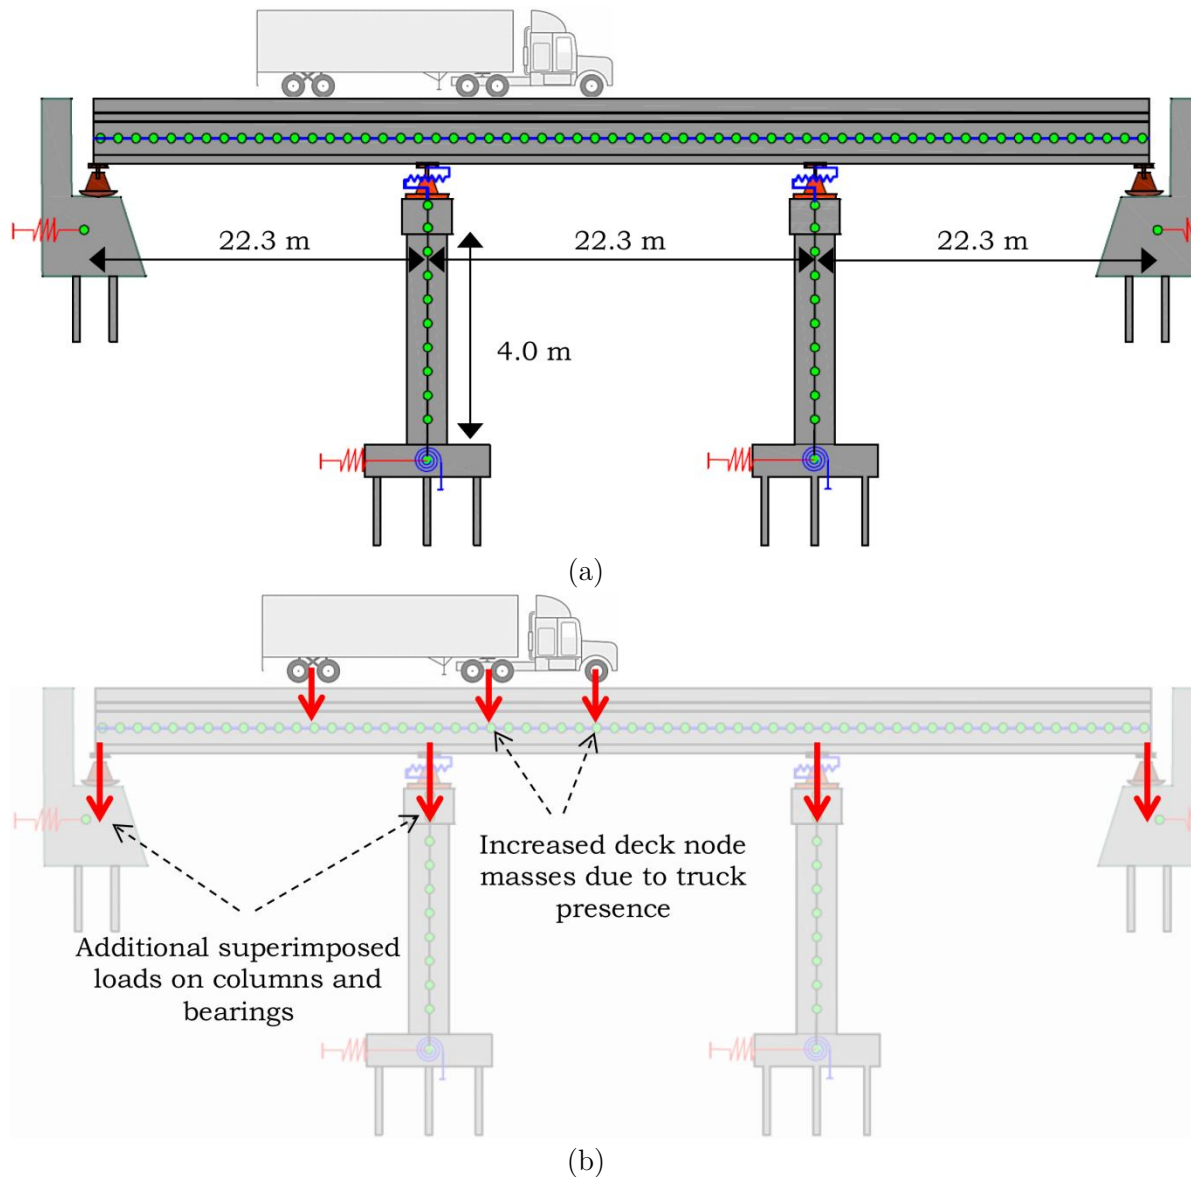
a) Case study multi-span continuous (MSC) steel girder with a superimposed truck load at any random location atop the bridge deck, and b) additional loads on bridge deck and other critical bridge components due to truck presence
